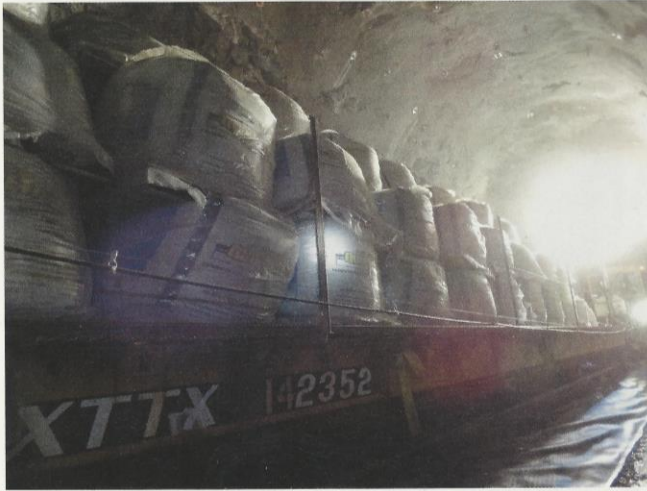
Fifty bulk bags loaded on a flat car for final liner installation
